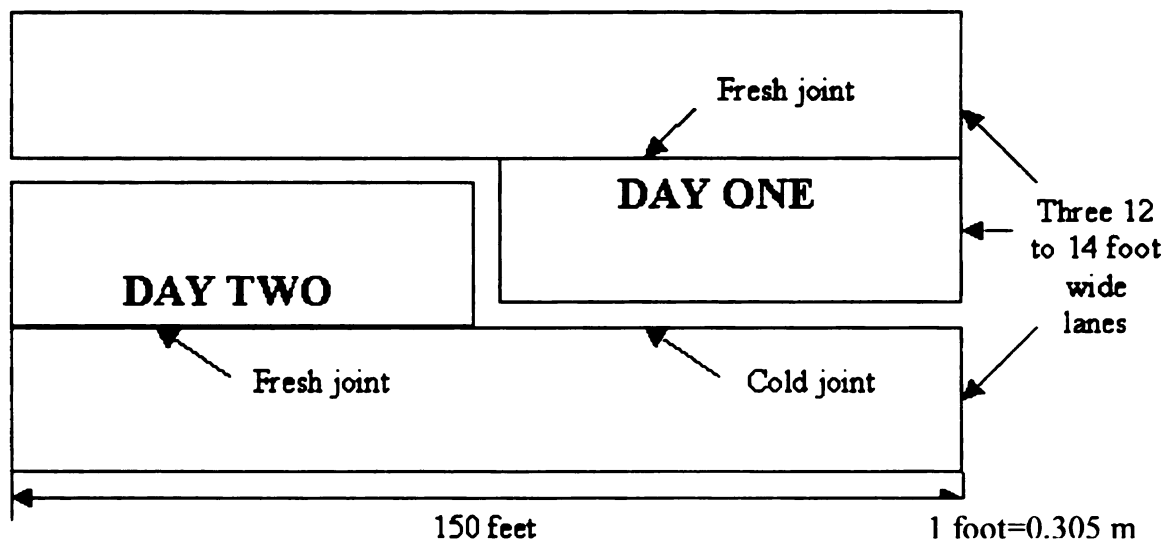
Recommended Test Section Setup (After Pittman [2]).
